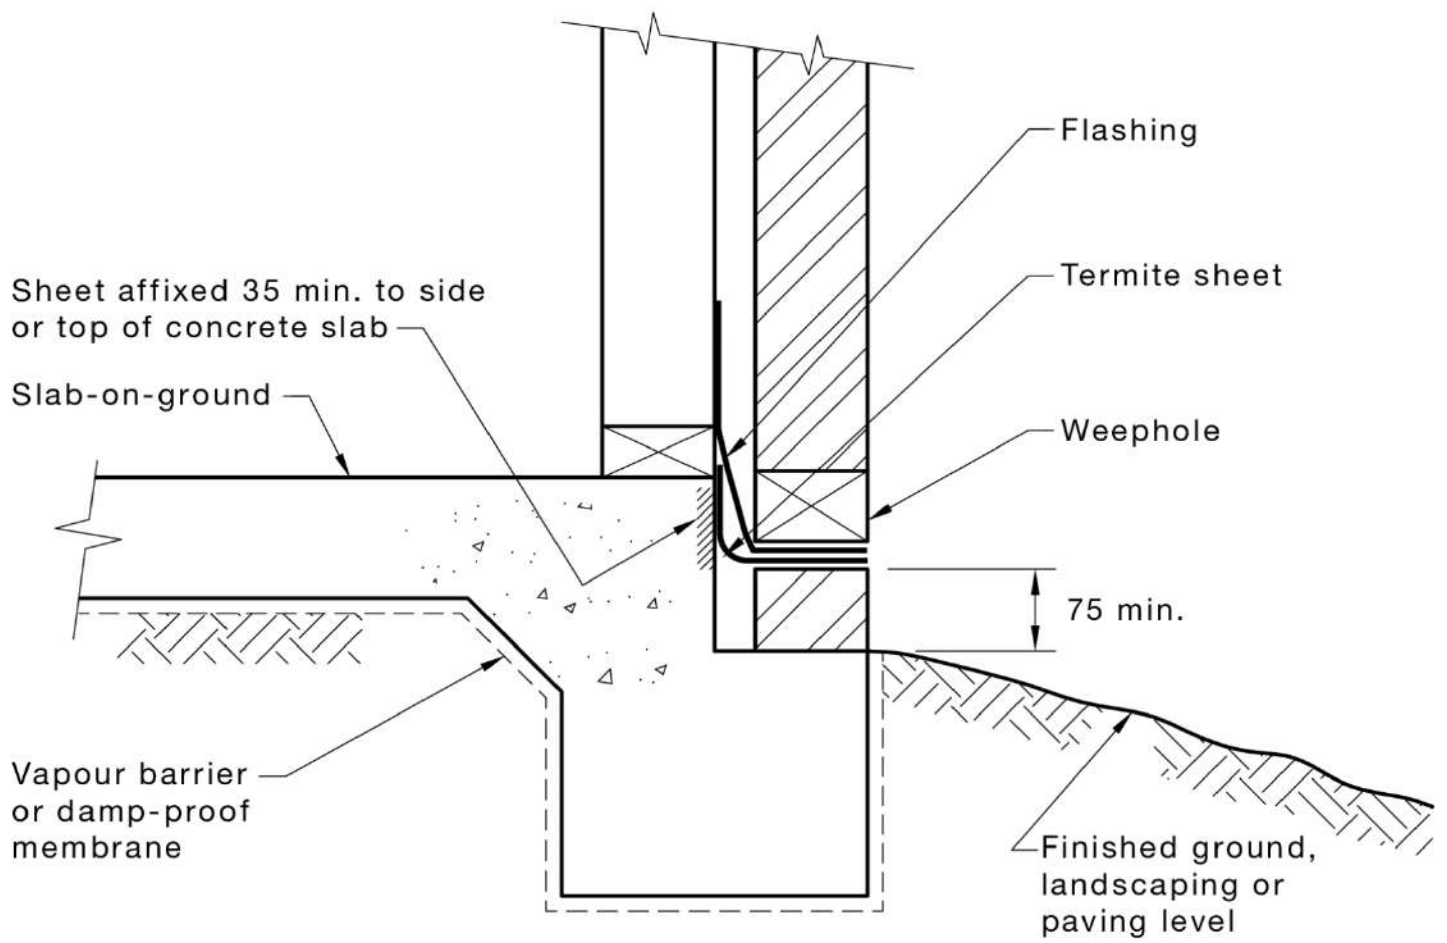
Typical sheet installation to external wall with concrete floor slab
